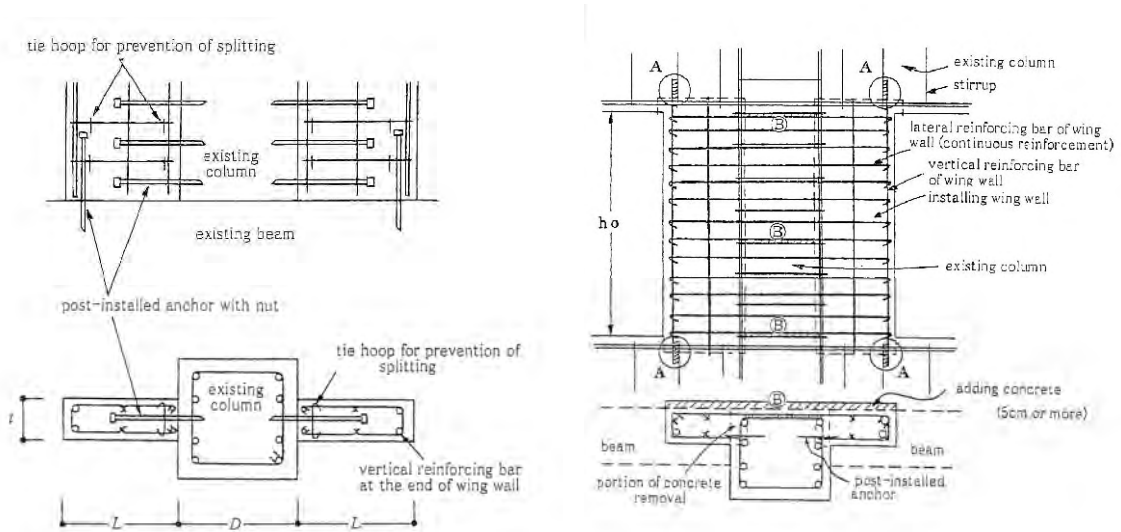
Framing Elevation with Walls for Retrofit (Case 2)
